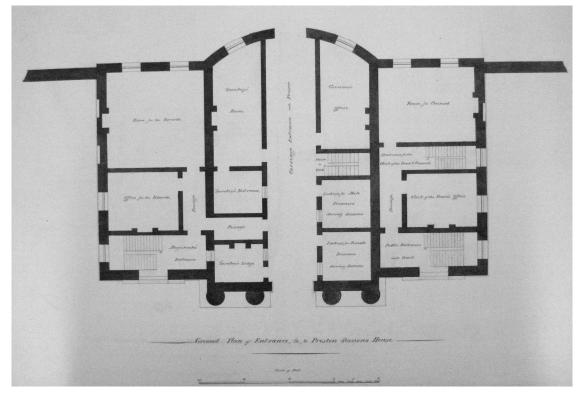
Proposed ground plan of entrance etc. for Preston Sessions House, Thomas Wright, June 1824 (LRO QSV/12)
